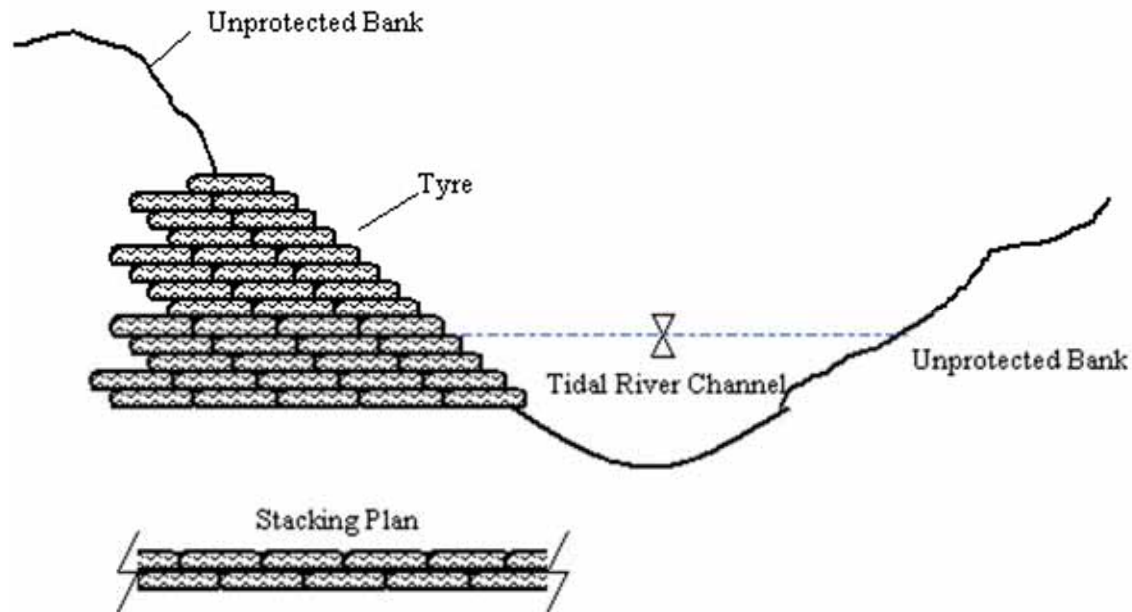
Schematic of the tyre revetment/retaining wall on the Mill Burn
